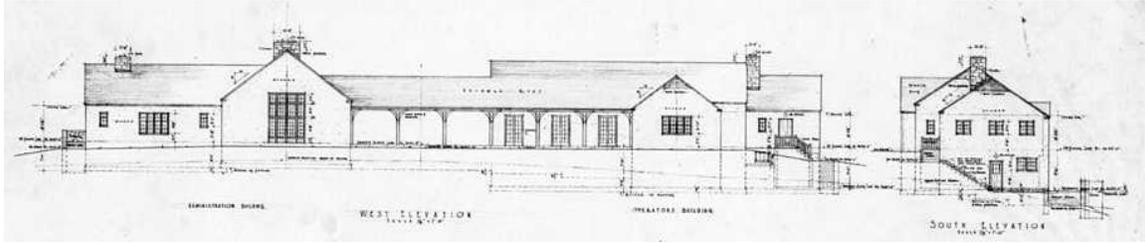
Detail of Howard Baker’s exterior views for West Elevation and South Elevation plans for the Wind Cave National Park Administrative Building, ca. 1934. The unique blend of stucco, stone, and timber in a vaguely mission-style of architecture became the aesthetic signature of Wind Cave National Park. Source: Library of Congress.
